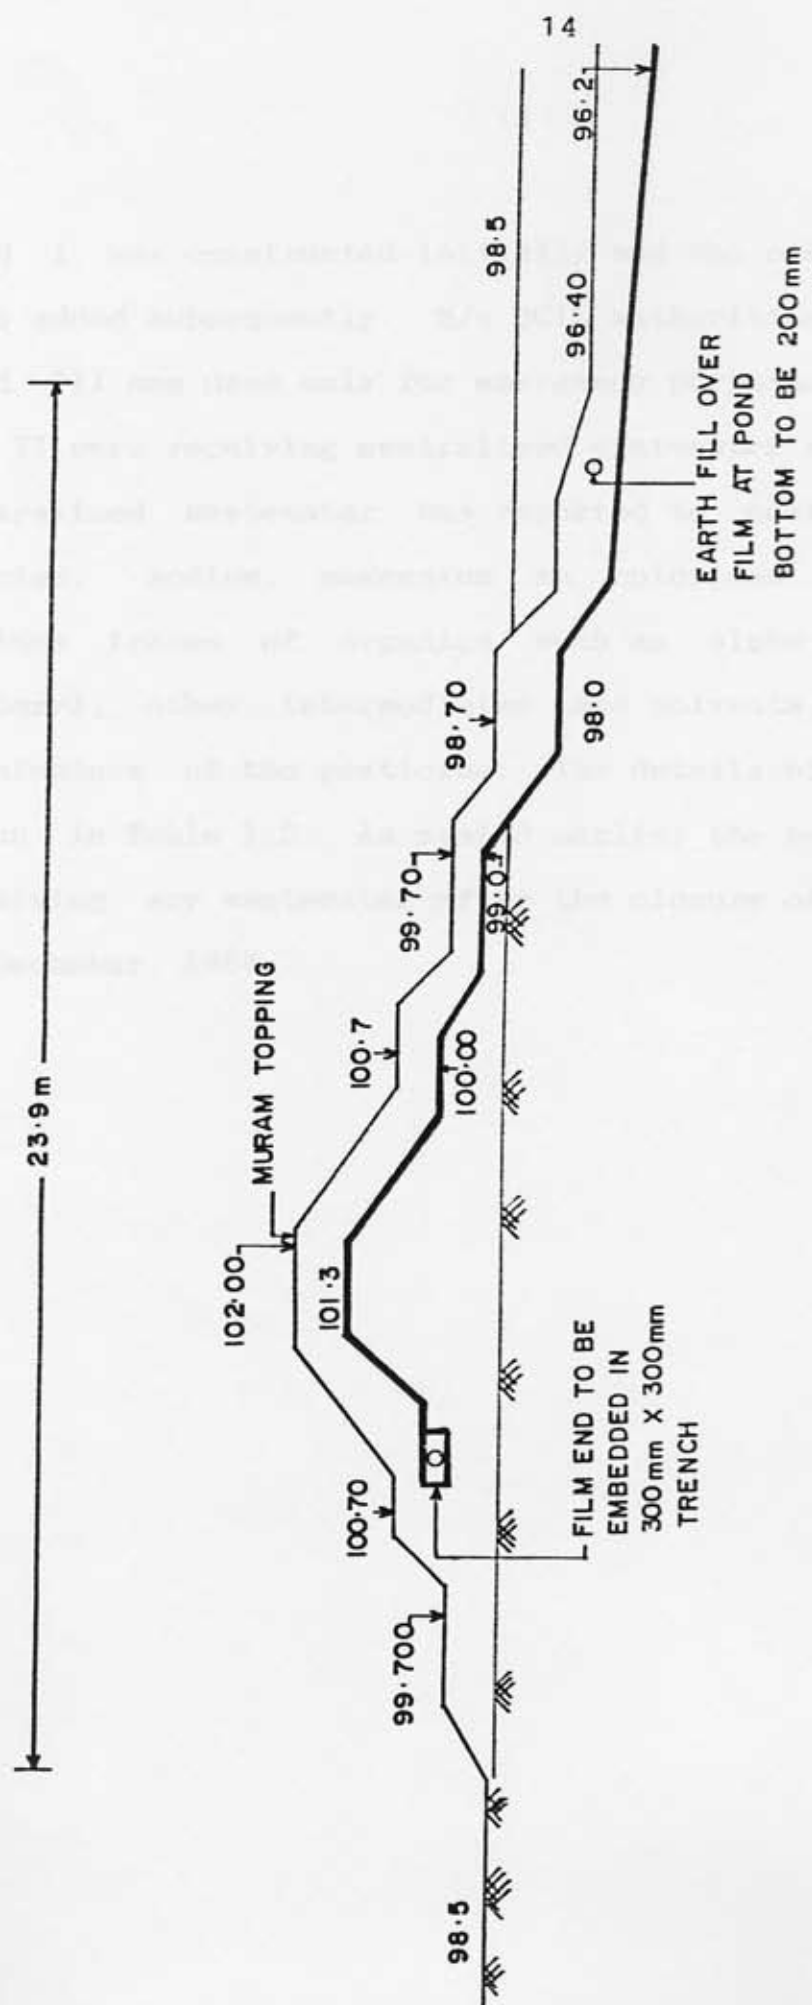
CROSS SECTION OF SOLAR EVAPORATION POND
